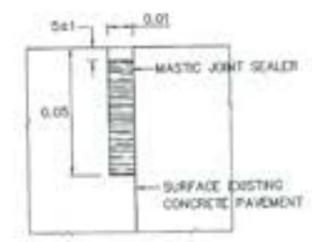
DETAIL OF SAWS FOR LONGITUDINAL JOINT
